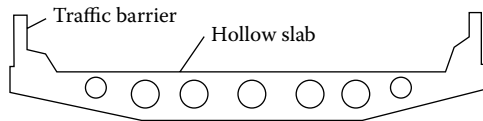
Cross section of a hollow slab bridge (with circular holes).
